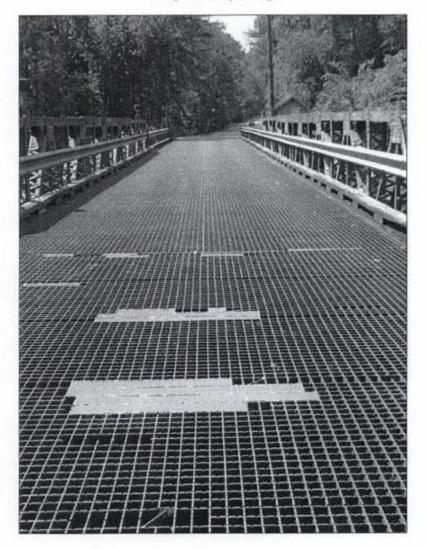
Roll 2702-1, Exp. 3; Main Span, Facing North
